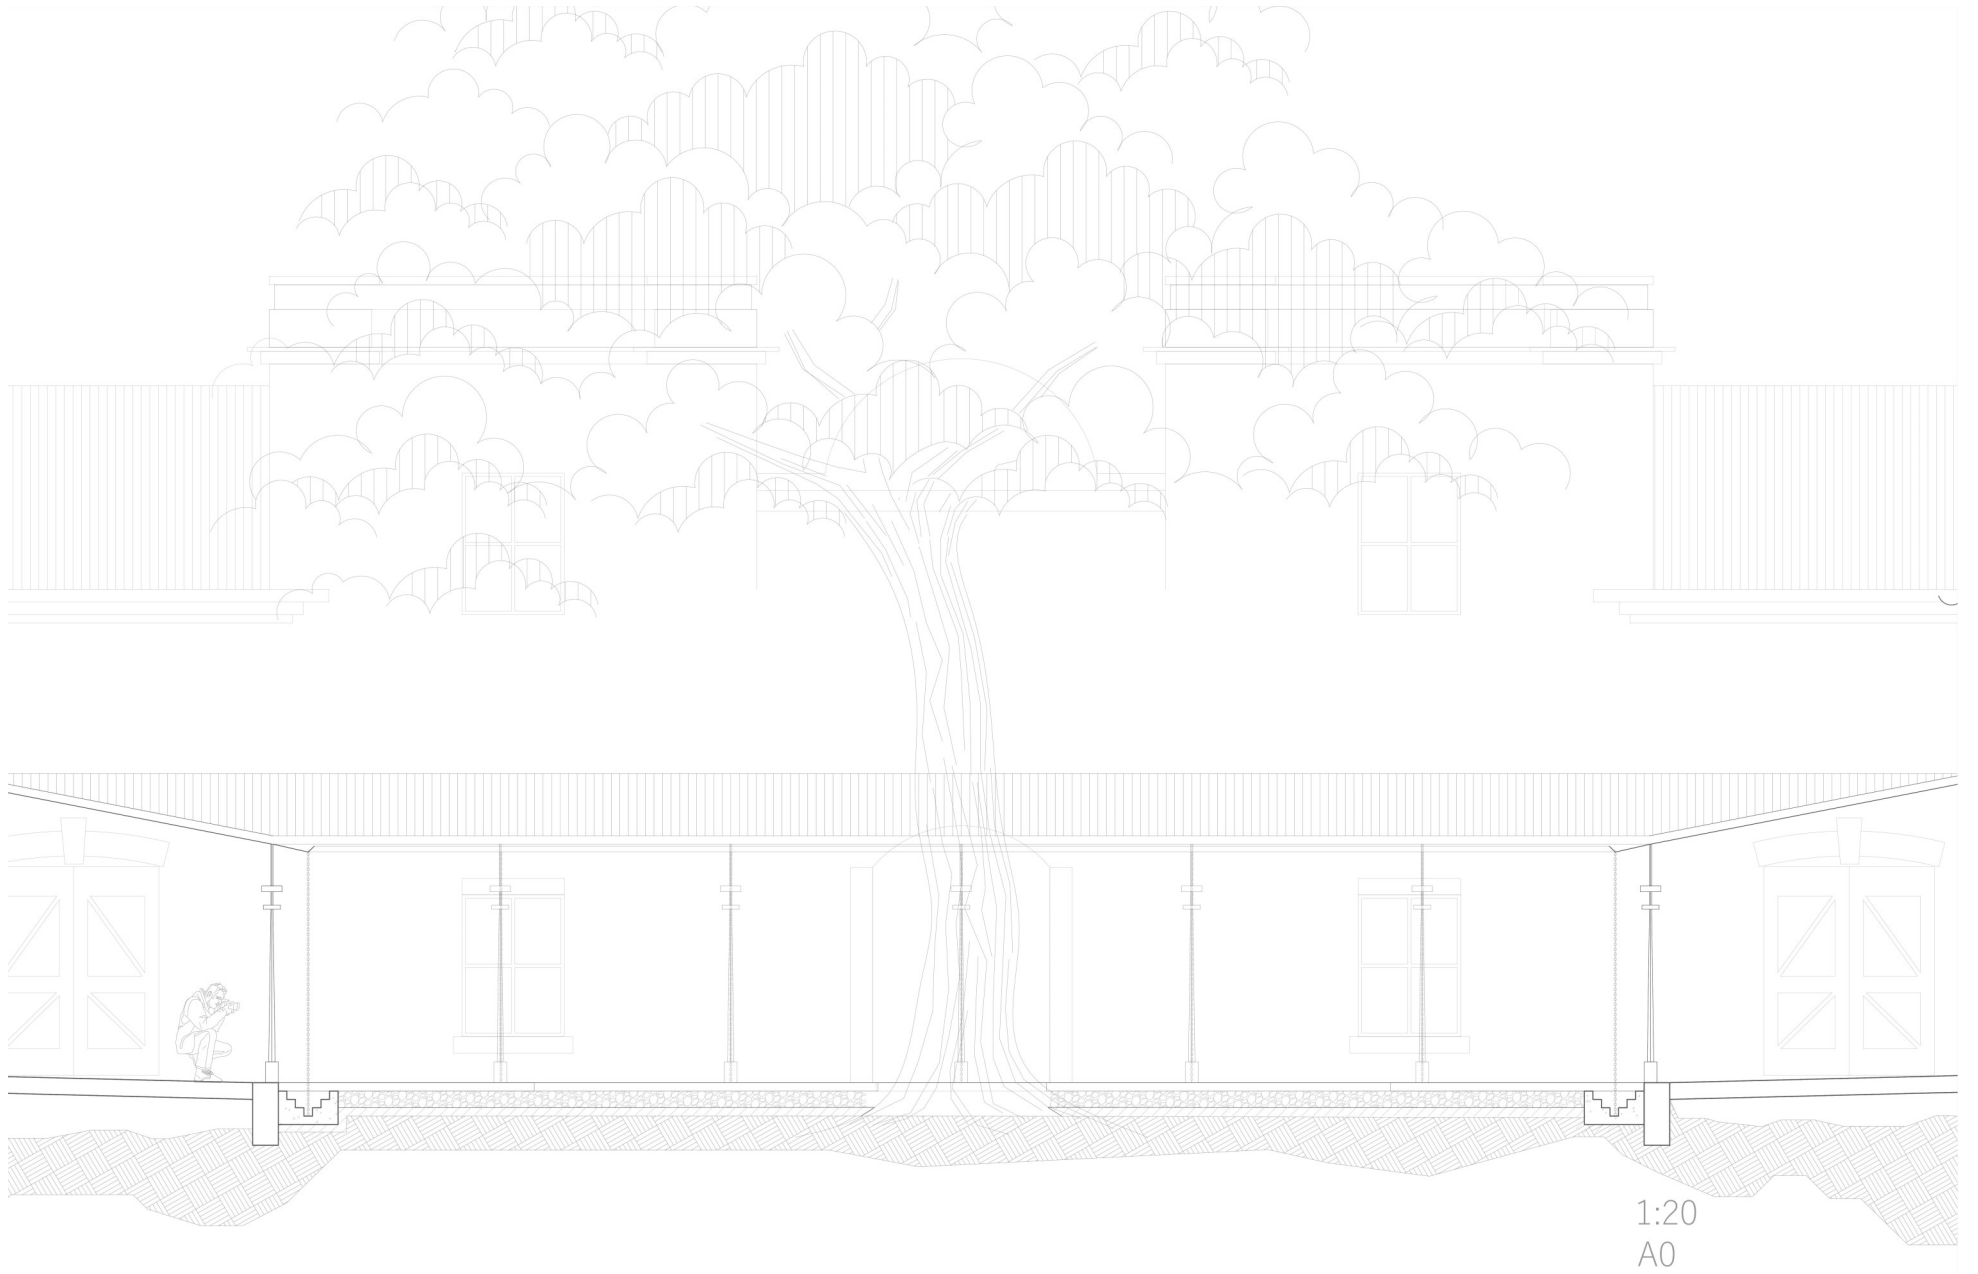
Proposed Section from east wing to west wing through Staatsmuseum 1:20 (Author 2020)
